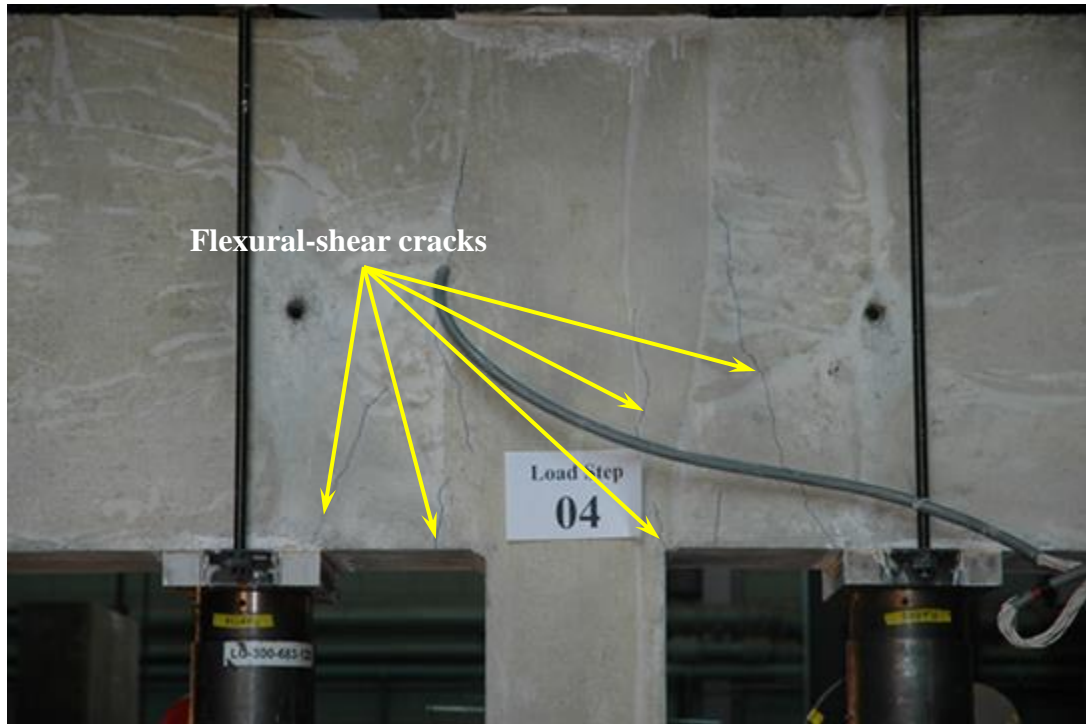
Flexural-shear cracks in top beam of TS01
